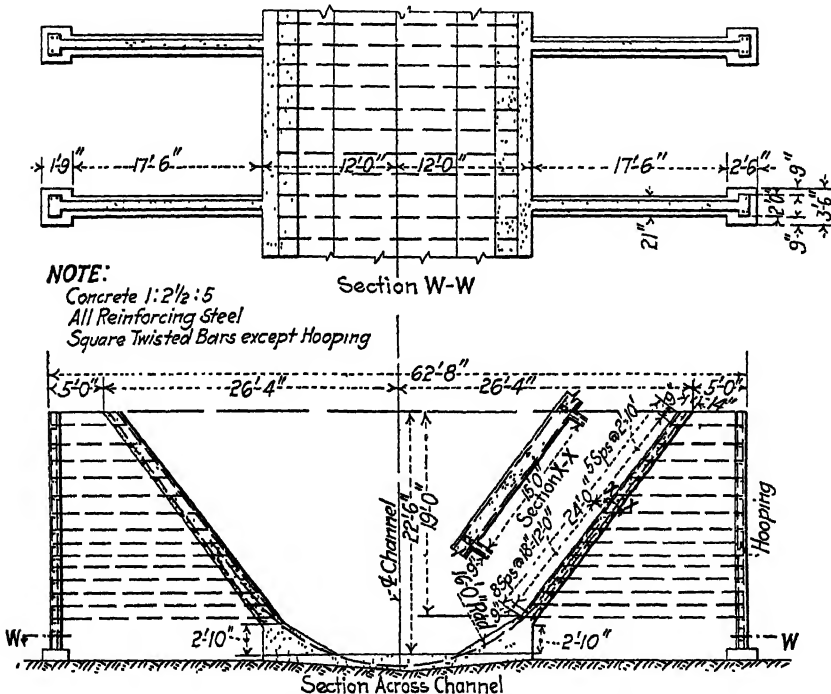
DETAILS OF CONCRETE CHANNEL WALLS.
